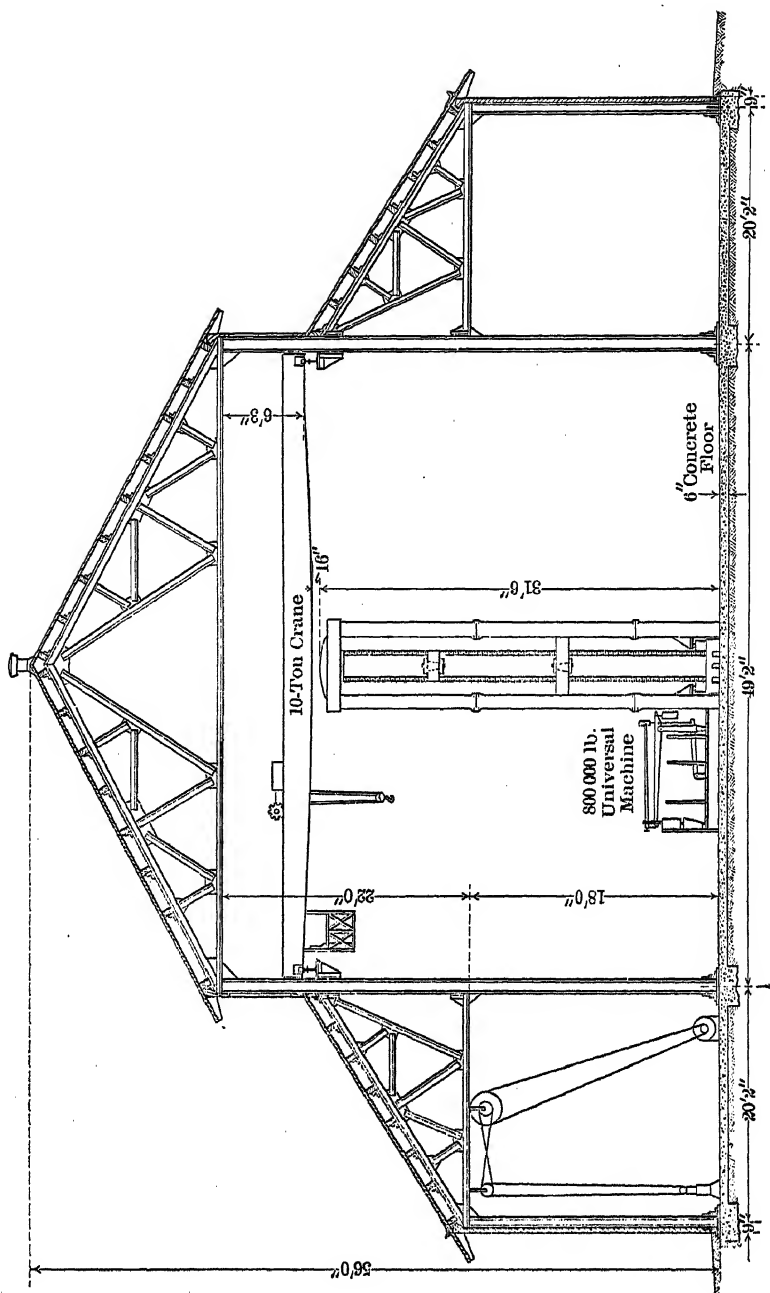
SECTION OF FRITZ ENGINEERING LABORATORY.
